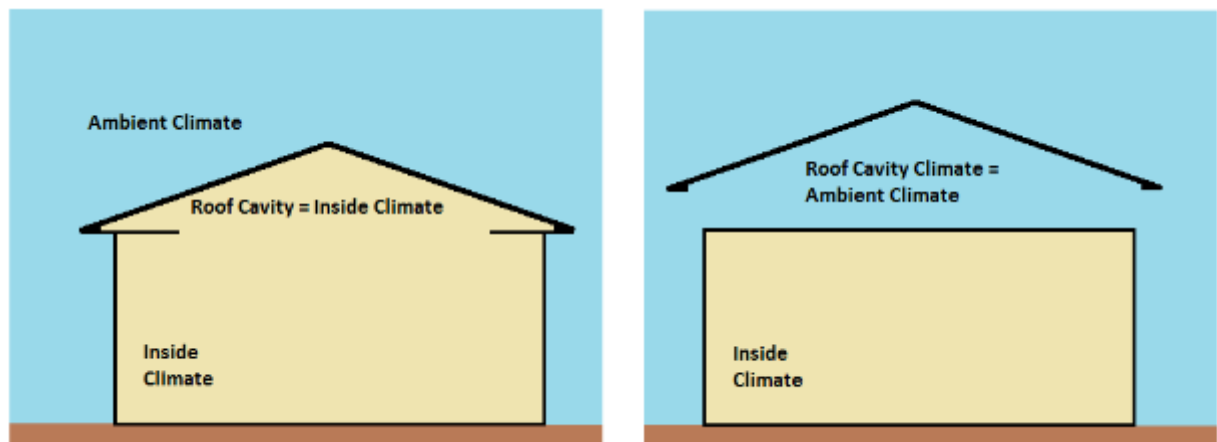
Idealisation of a warm roof and an ideally ventilated roof cavity.
